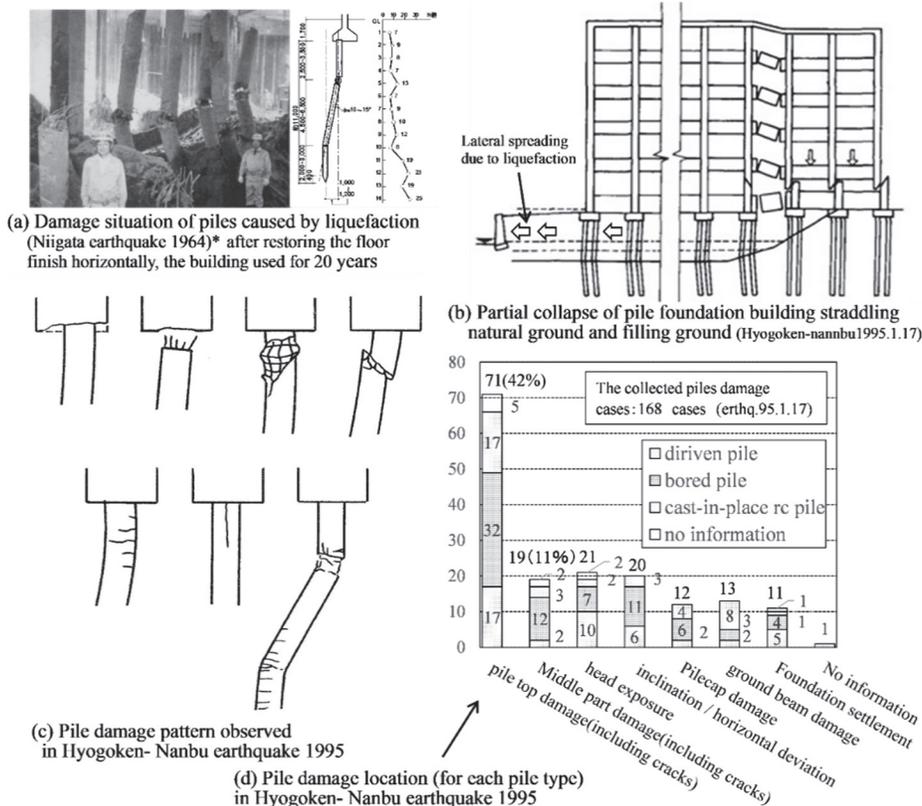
Earthquake Damage Case of Pile Foundation Building ((a) Niigata1964), (b) Hyogoken-nanbu1995), Related damage investigation Result. ((c) Damage pattern, (d) Damage Position, (d) Survey of damage position of pile.
